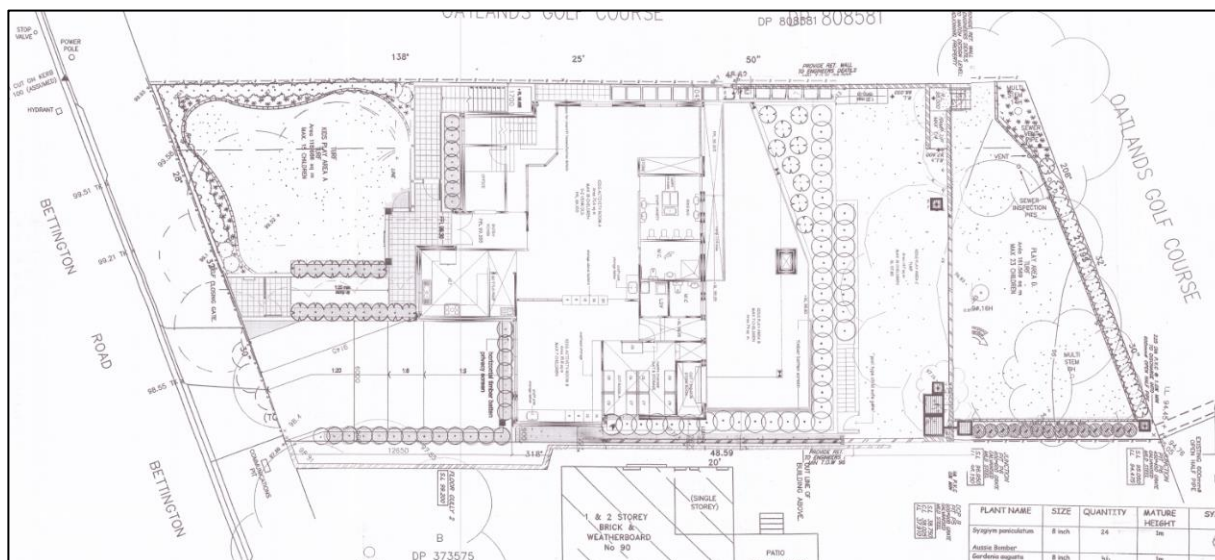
Approved ground floor plans (DA/491/2006) child care centre, 92 Bettington Road
